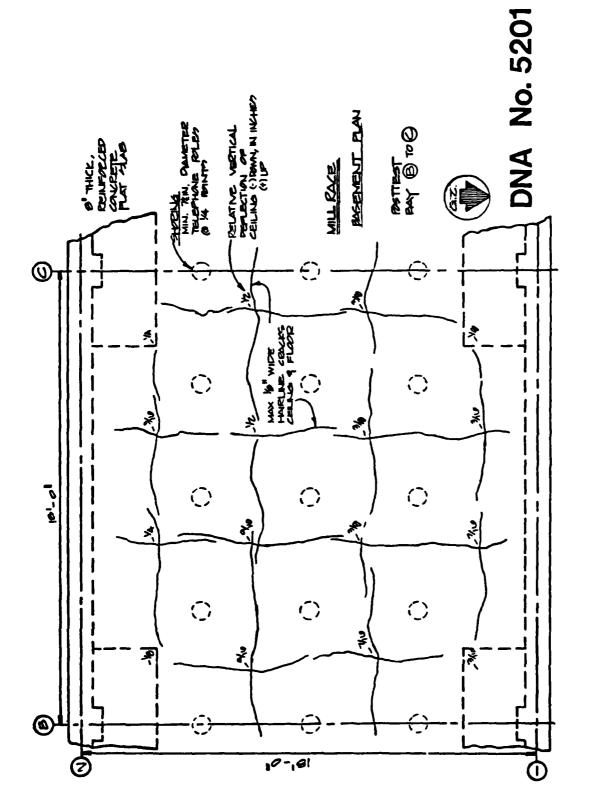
MILL RACE Slab Cracking Pattern.
